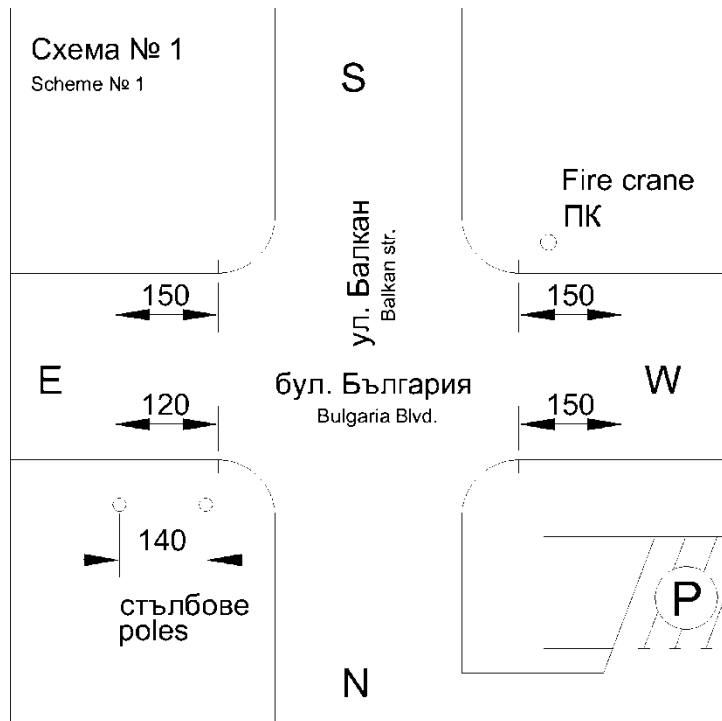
Missing sidewalk flooring /. Липсваща тротоарна настилка
